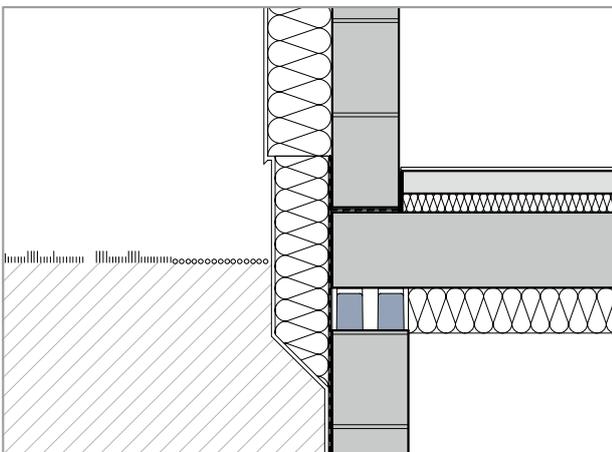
Schöck Sconnex® type M underneath the basement floor
